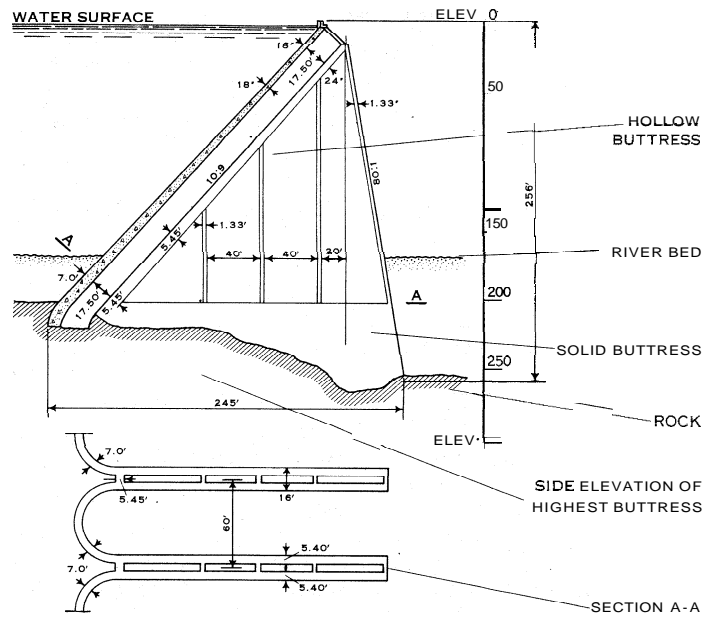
PLAN OF MULTIPLE-ARCH DAM, LAKE PLEASANT, ARIZONA. SHOWING (ABOVE) SIDE ELEVATION OF HIGHEST BUTTRESS AND (BELOW) A SECTION THROUGH THE ARCHES AND HOLLOW BUTTRESSES
